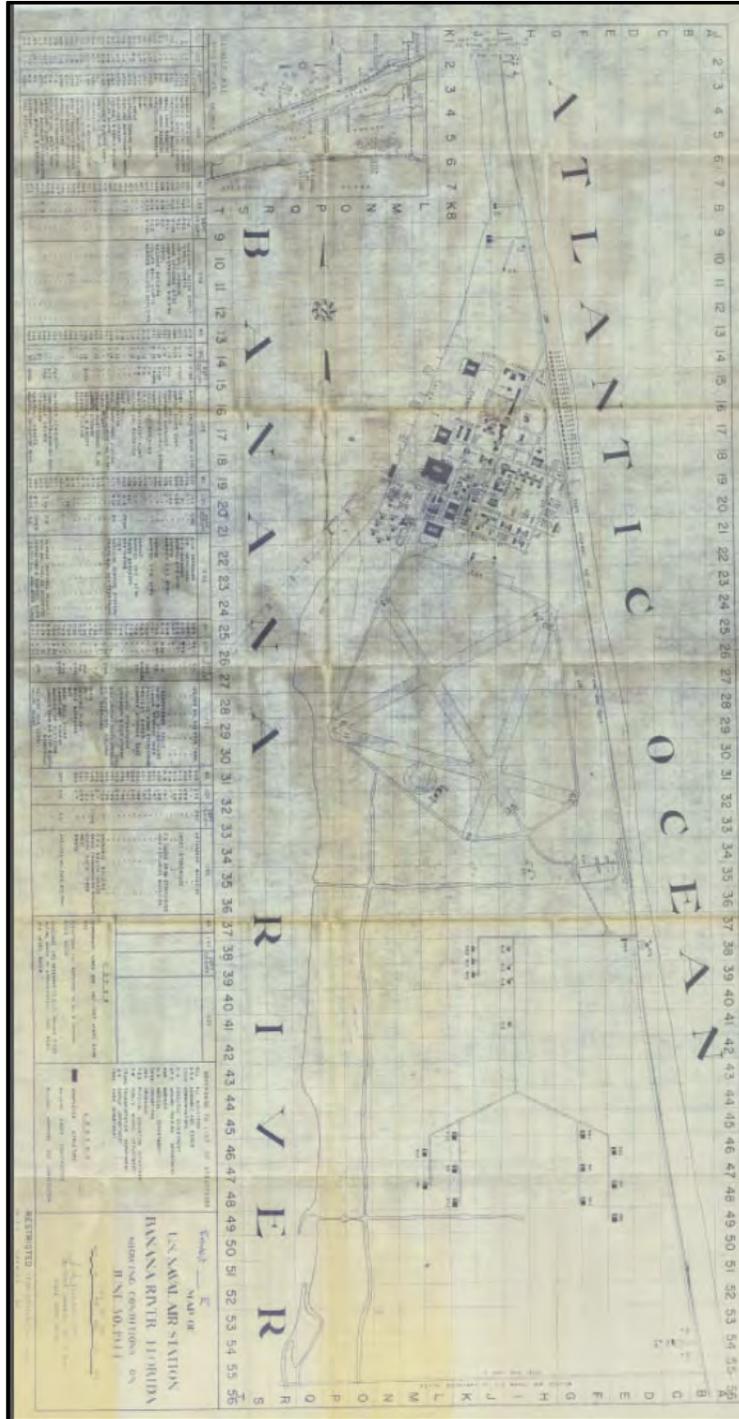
NASBR Site Plan - 30 June 1944⁶⁶
